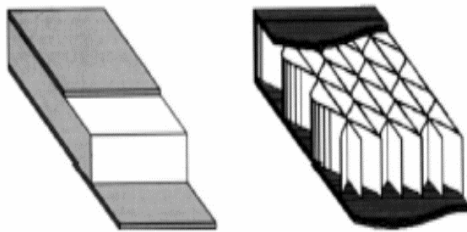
Examples of types of bridge structures with FRP decks [1]
